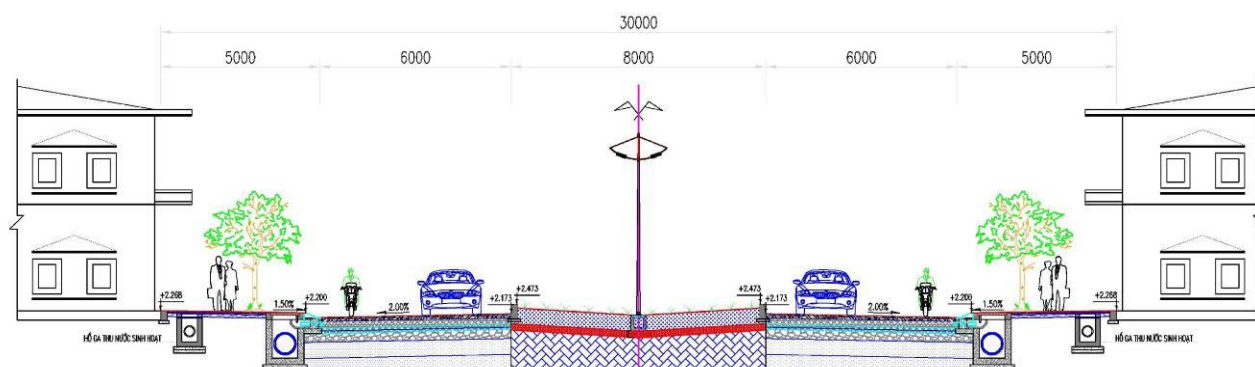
Cross Section 1 of Cai Son from Cai Son Bridge to connection to CMT8 road and provincial road 918
